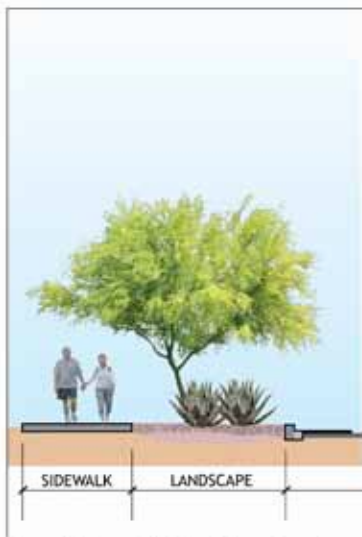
k: TYPE 1 - Sidewalk and landscape area with trees.
